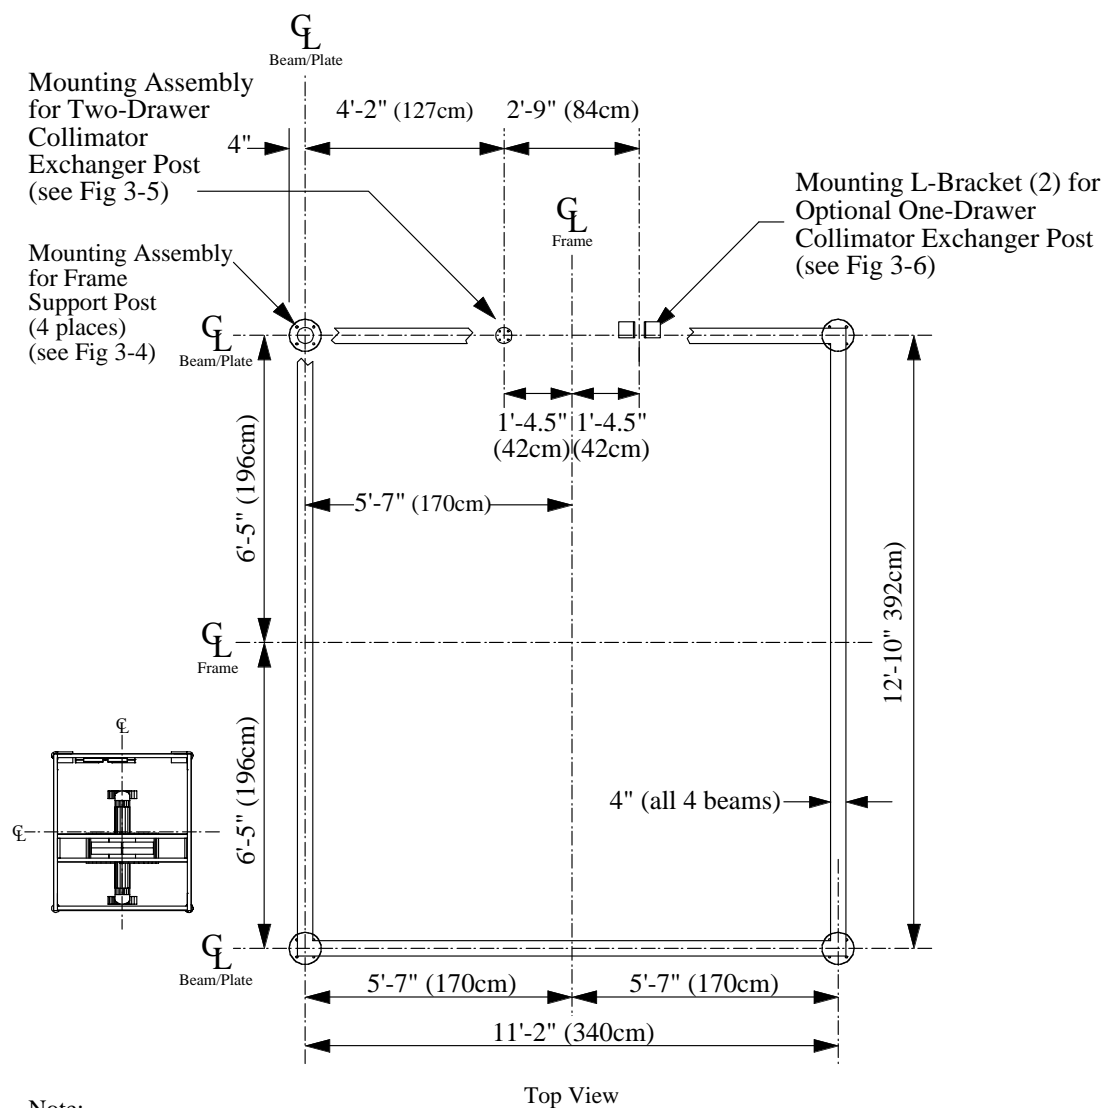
Skylight Anchor Plan, No Frame Extension
